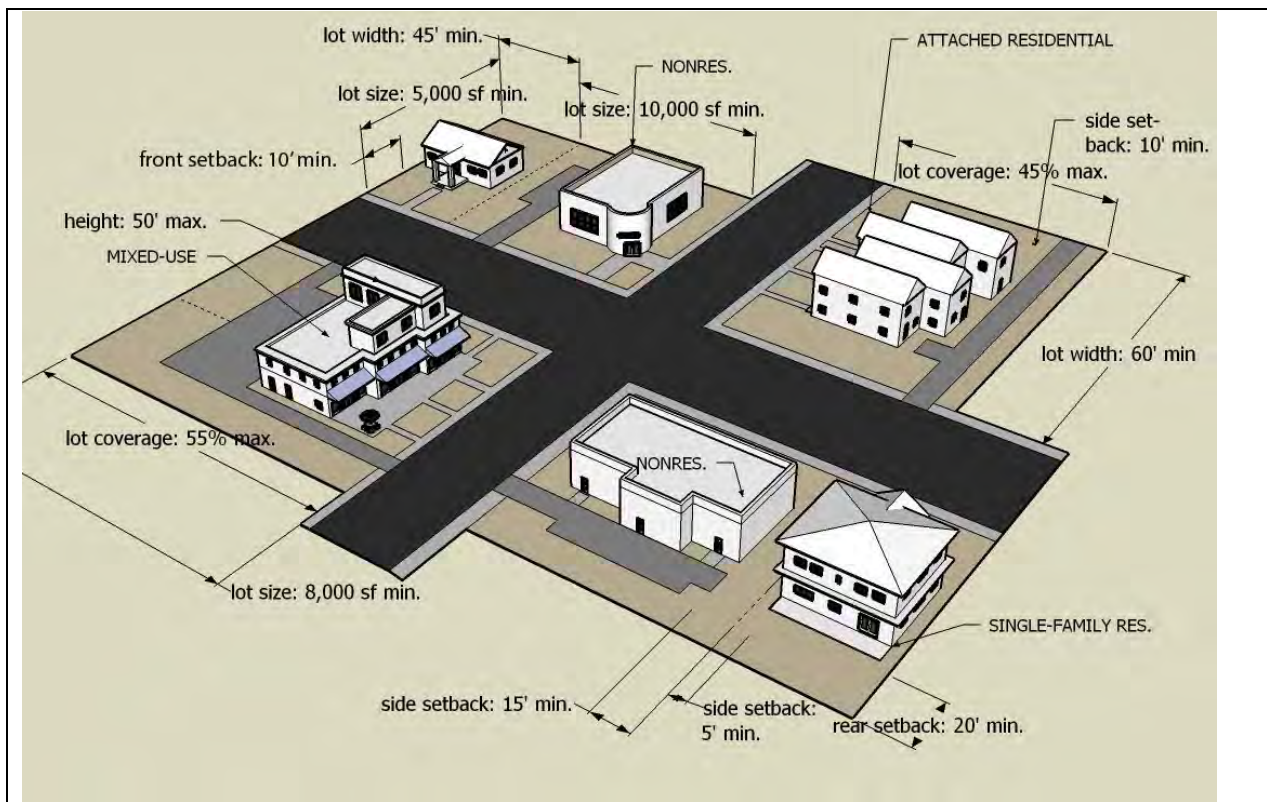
E.3.c: NC Typical Building/Lot Configuration
